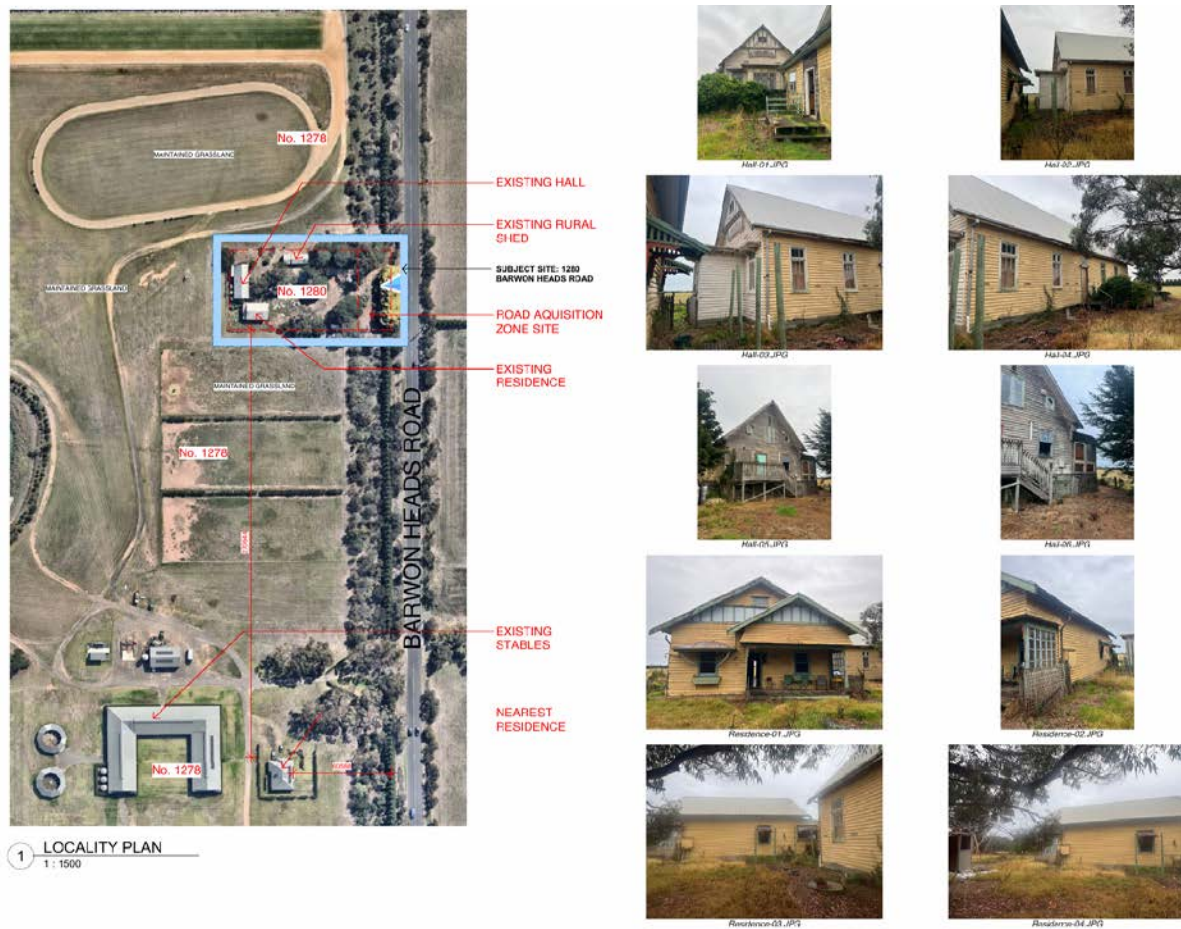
Locality plan and site photographs of the former Hall and existing bungalow in their rural setting (JDA Architects, TP.01).
